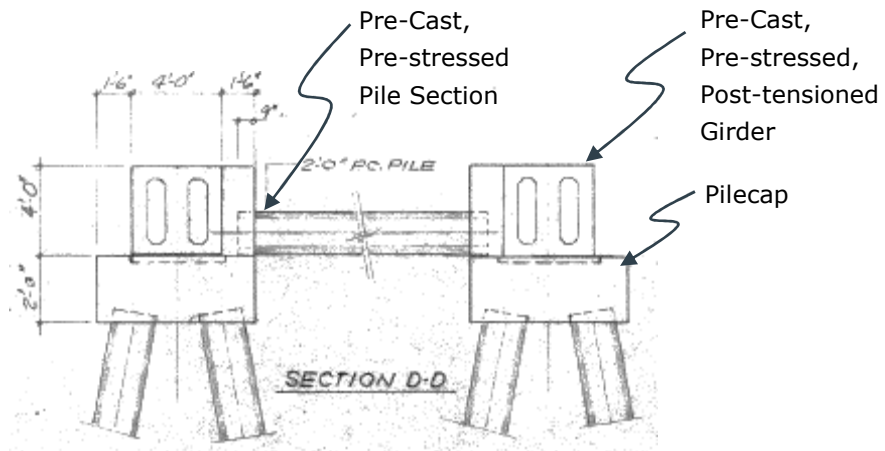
Typical Cross-Section of Dock Superstructure (Con-force DWG 9315-1)
